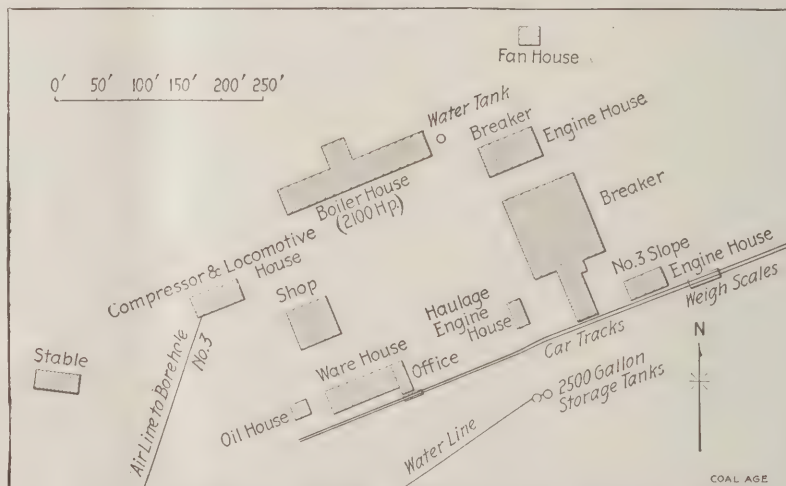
LAYOUT OF COLLIERY BUILDINGS AND RAILROAD TRACKS
